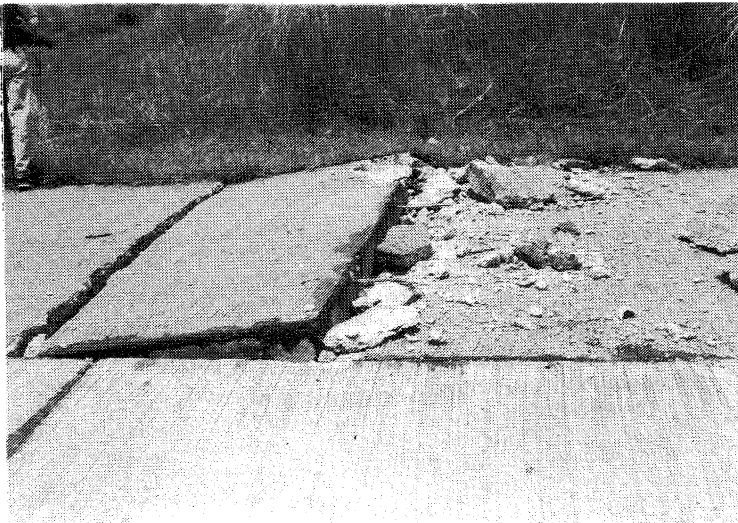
West of Rizal; compression failure of concrete road paving
